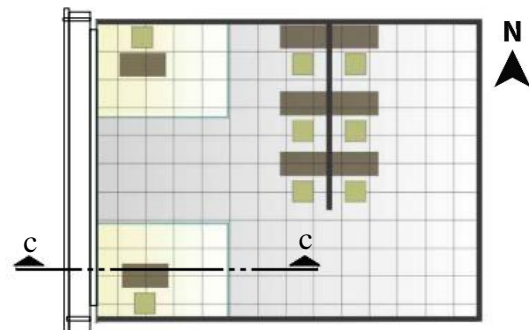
A plan illustration of the proposed second glazed façade for the west oriented Zuwwar tower.
